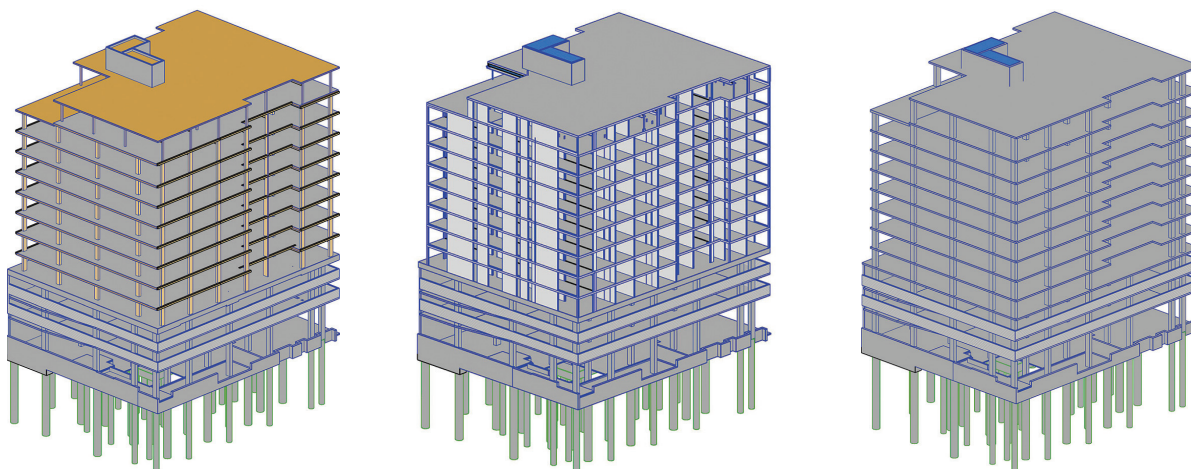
Schematic 3D images of the three alternative buildings—designed with mass timber, cold-formed steel, and concrete (left to right)
